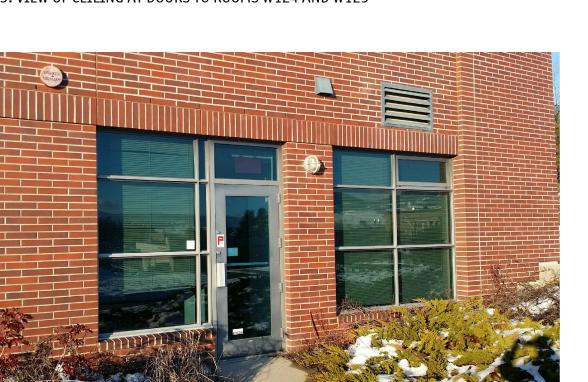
VIEW OF EXTERIOR WALL AND GRILLS AT GRIDS 1/J-K
